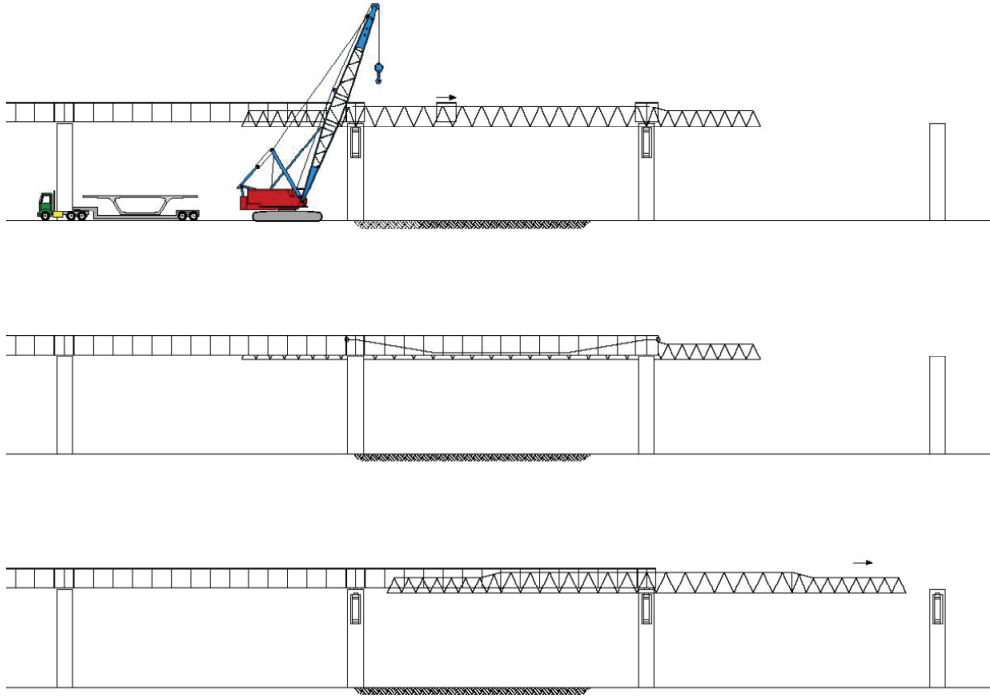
Precast segmental 'span-by-span' construction [FHWA, 2004]
